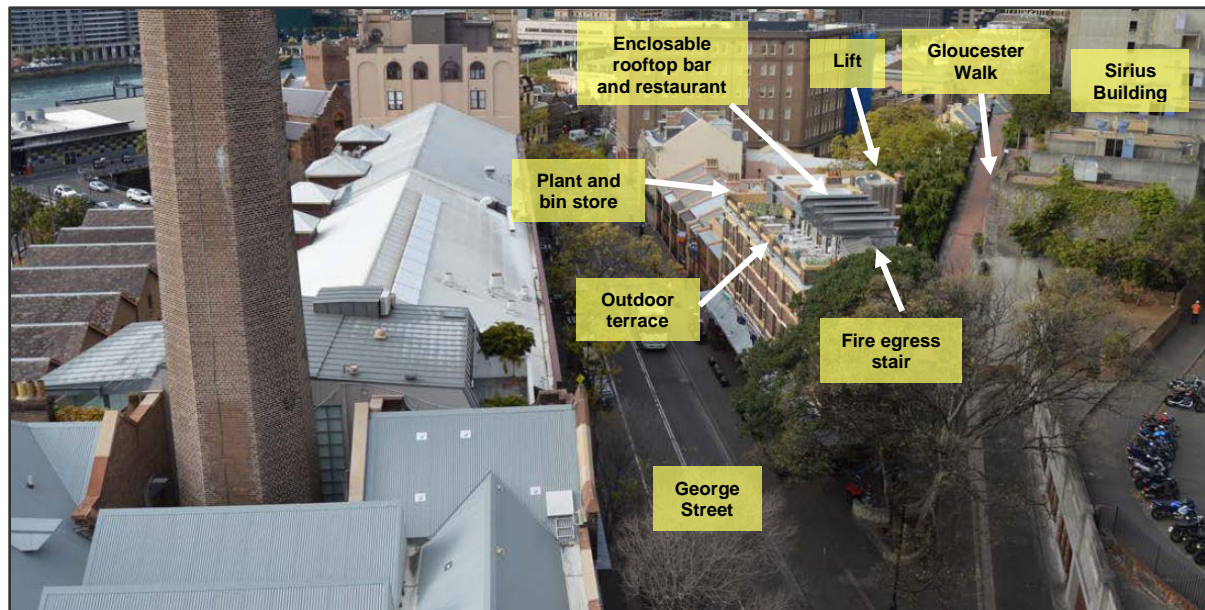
| Proposed rooftop works viewed from north of the site (Base source: Applicant's VIS)
